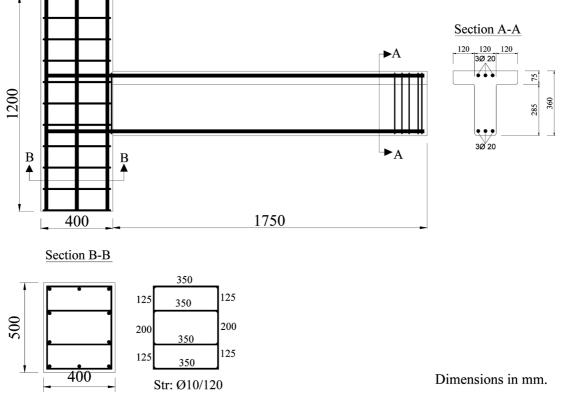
Test specimen reinforcement and geometric dimension details (Anil 2008)
